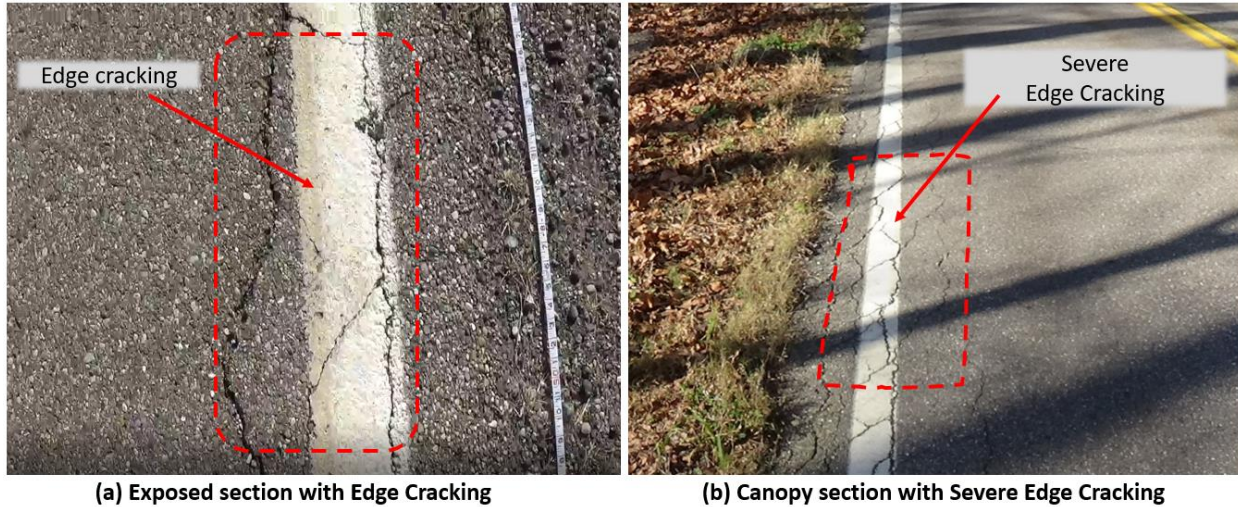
Pavement Surface Cracking Along Roadway Edges.
